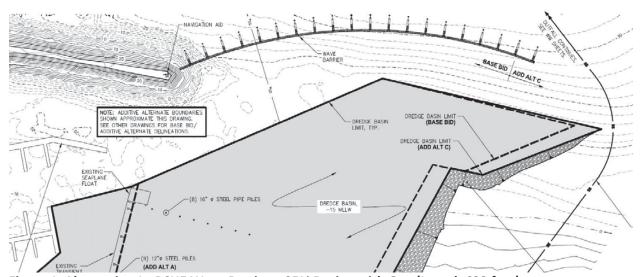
Alternative 1 - PCHE Wave Barrier - 95% Design with Gap (Length 633 feet)
